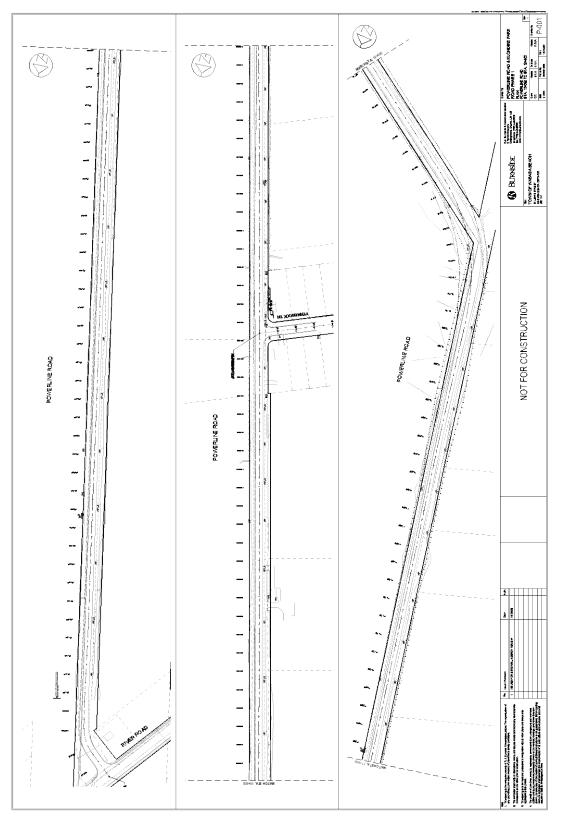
Proposed Plan – Page 1 (RJB 2011)
